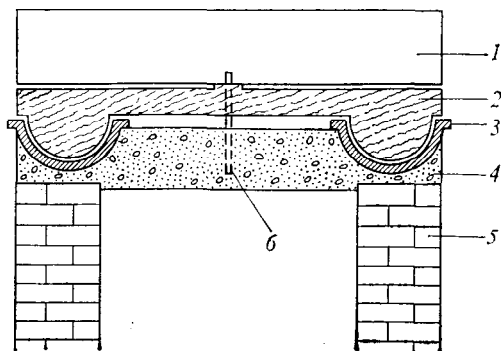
The Michelson-Morley apparatus. 1—sandstone slab, 2—wooden float, 3—trough filled with mercury, 4—cement foundation, 5—brick foundation, 6—centering pin.
